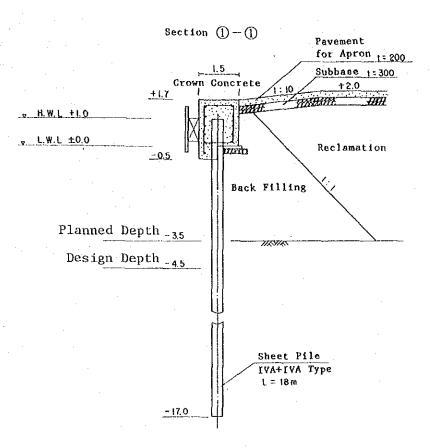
(1) Plan of Cantilever Sheet Pile Type Structure
